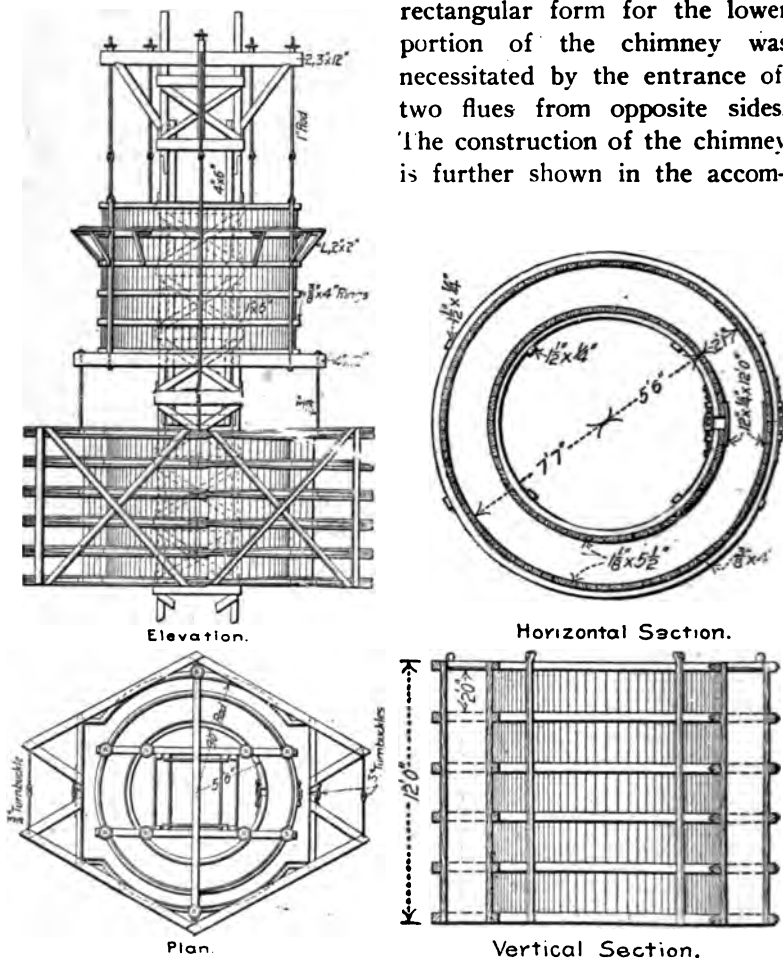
Tower and Falsework for Building Los Angeles Chimney.
